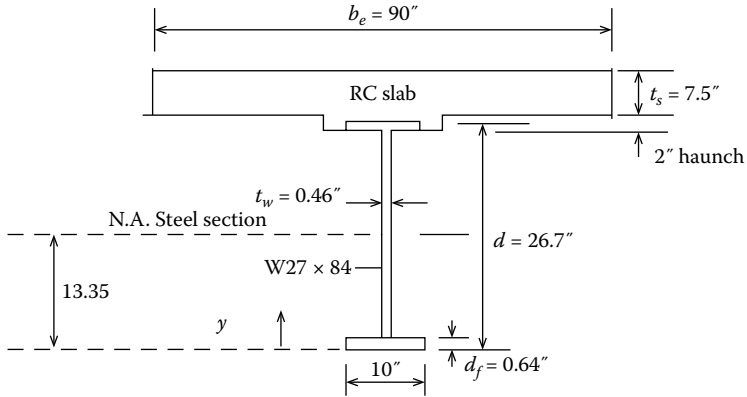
Cross section of composite girder for Example 6.10.
